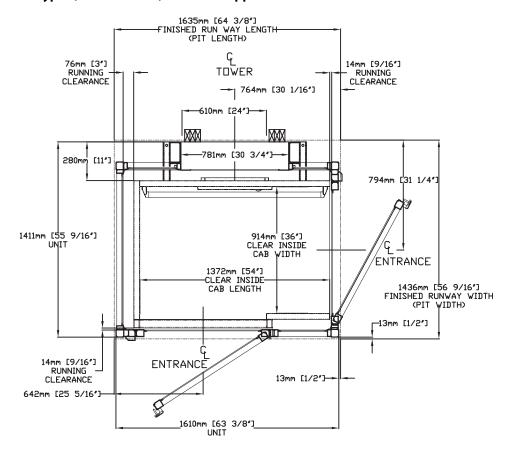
Plan View - Type 3, 36" x 60" Cab, Hoistway Application
